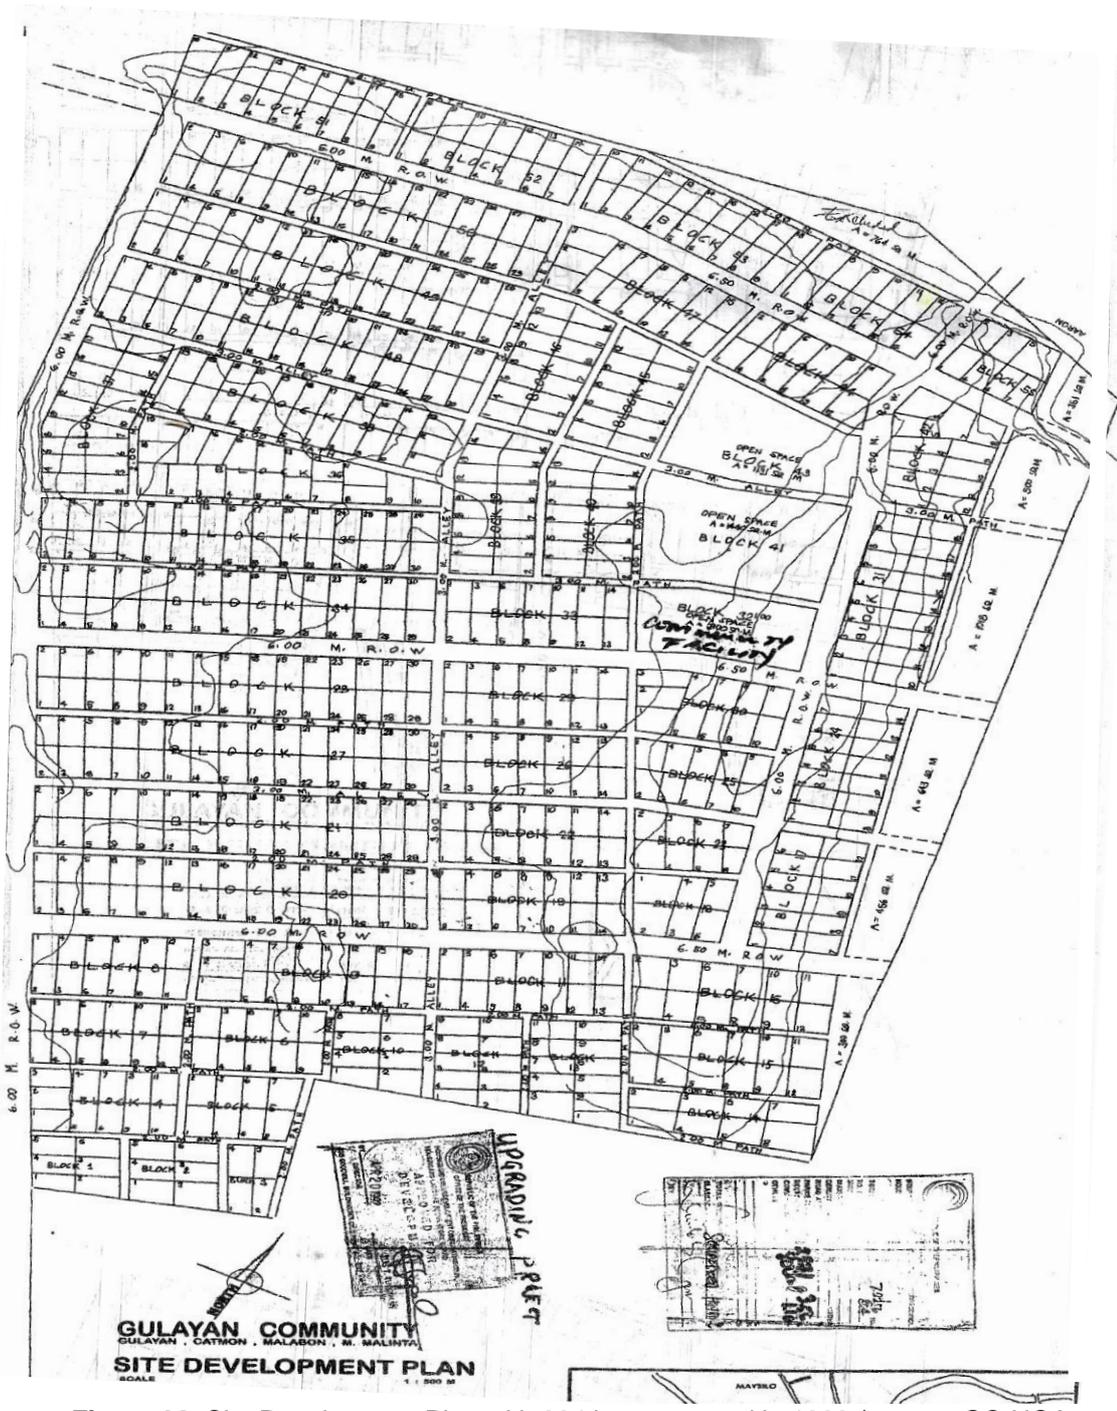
Site Development Plan with 804 lots approved in 1992 (source: GC-HOA, 2020)
